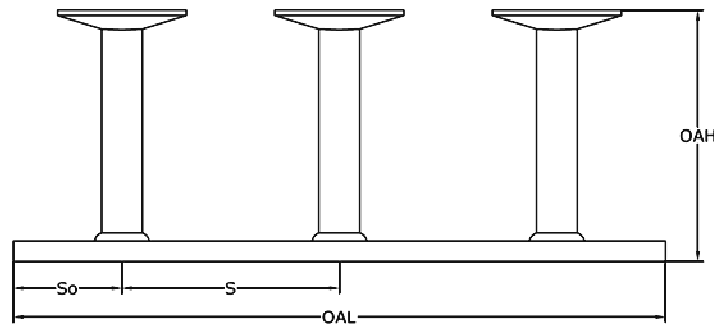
TYPICAL PSRR STUD REINFORCEMENT SYSTEM ASSEMBLY
